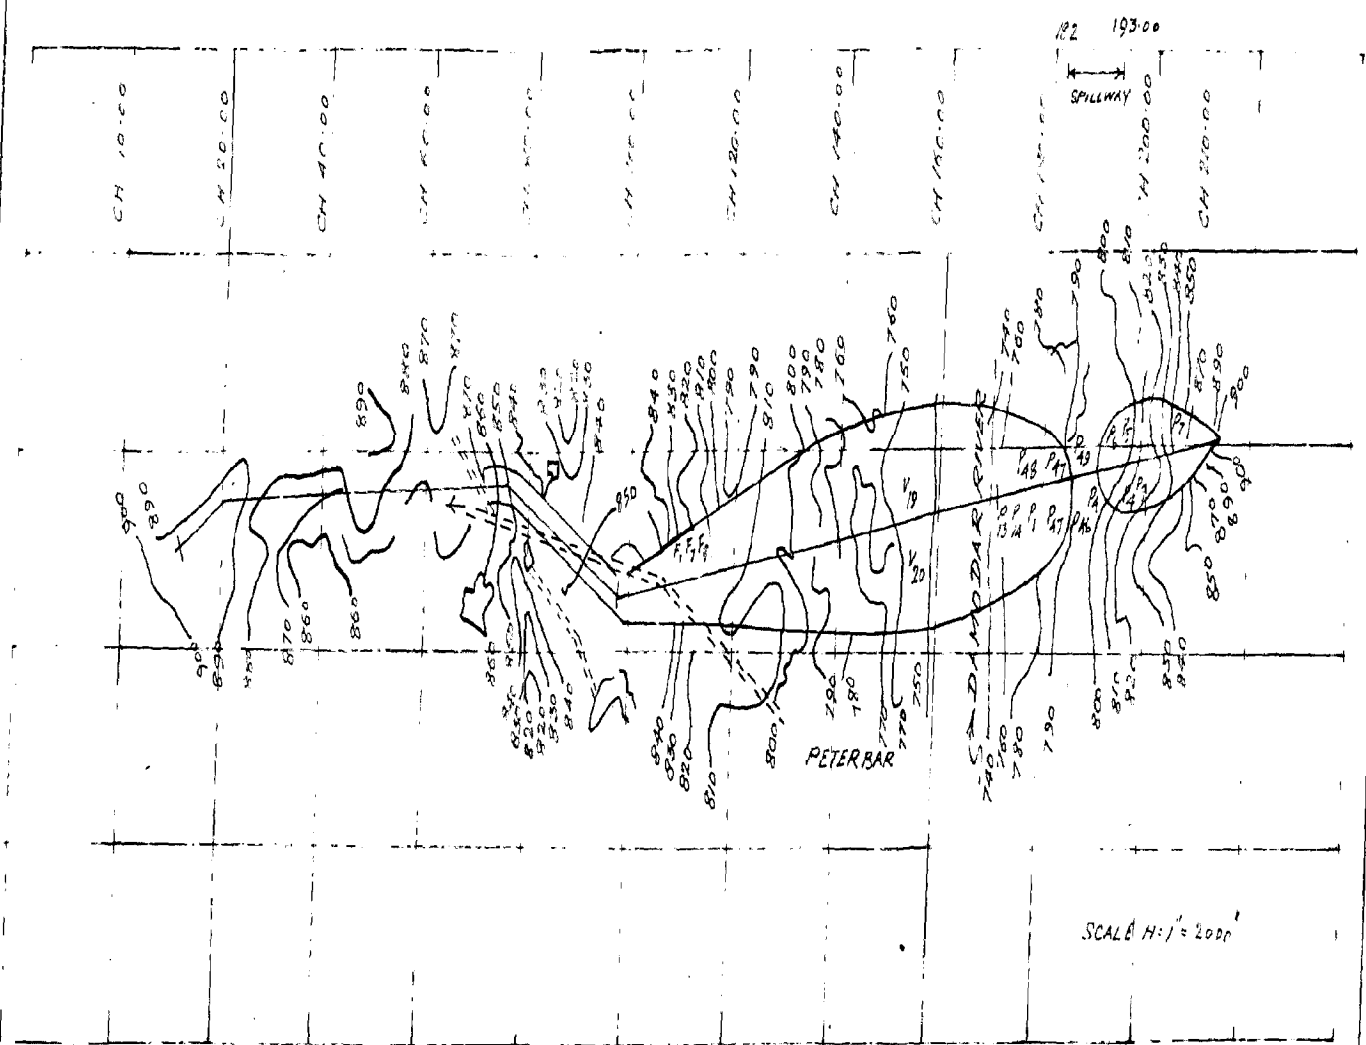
TENUGHAT DAM PROJECT - SITE PLAN
